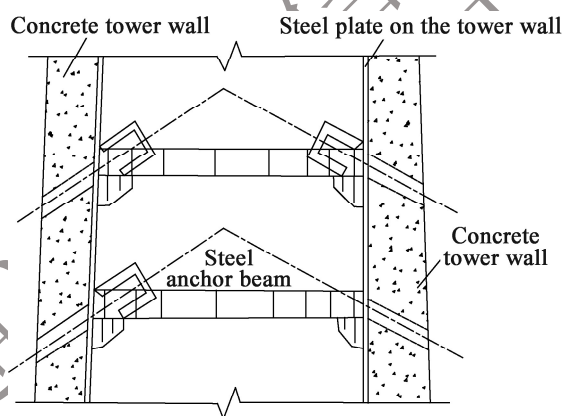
Anchorage on steel anchor beams (with corbel) inside concrete tower
